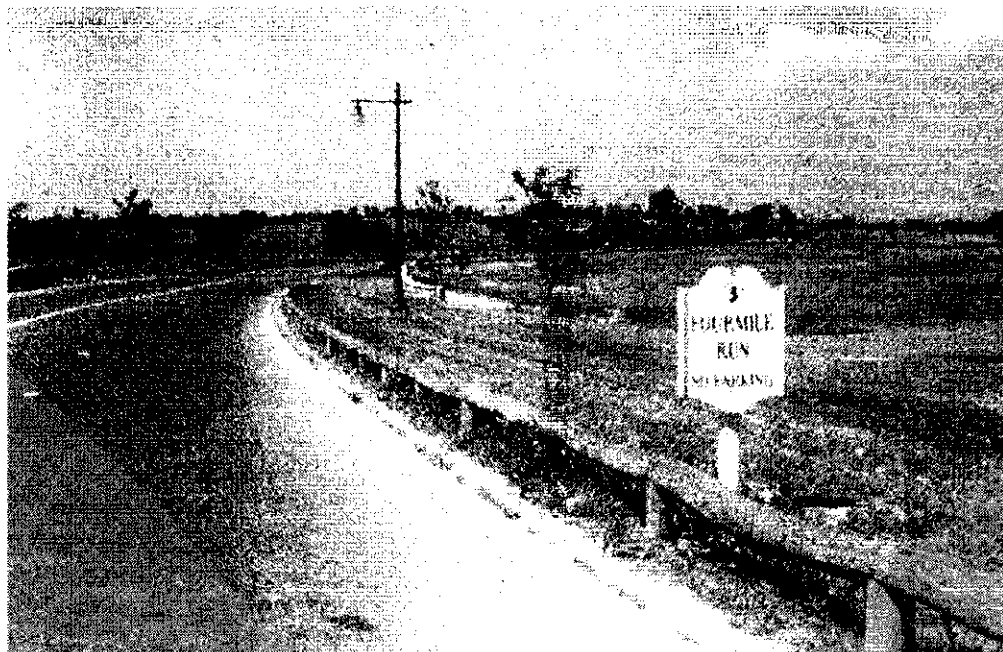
Low timber rail used primarily to prevent roadside parking (Mount Vernon Memorial Highway File #32-159, RG-30-N, NARA)
